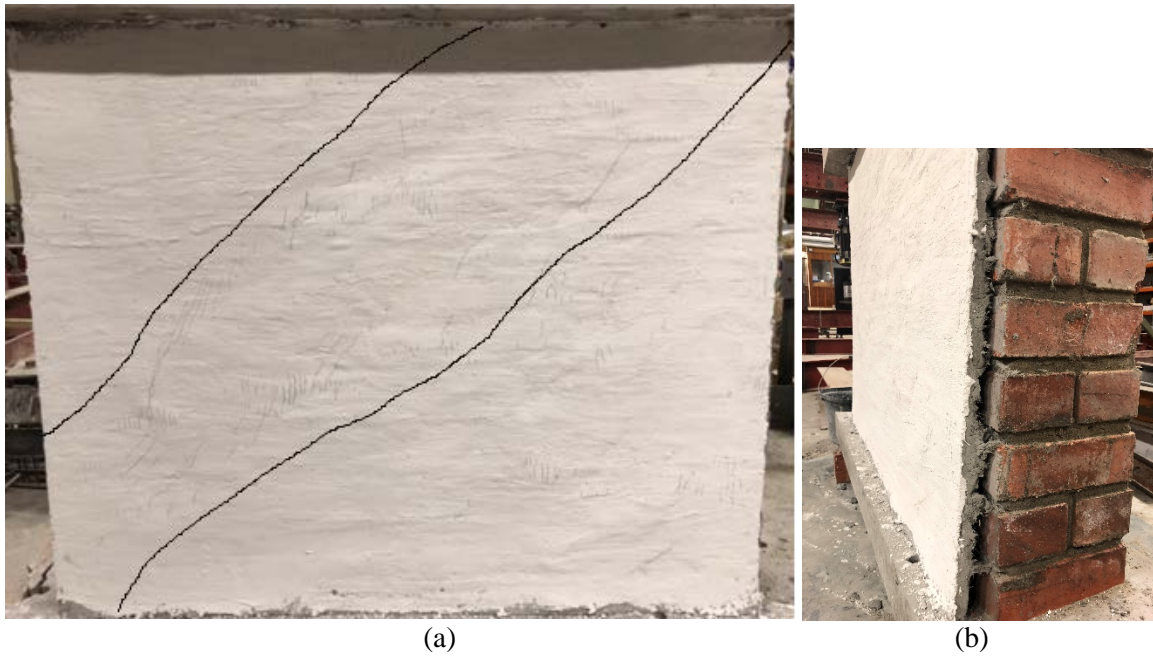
SW-100-200-01 (a) Crack patterns outlined; (b) delamination in bottom right corner.
